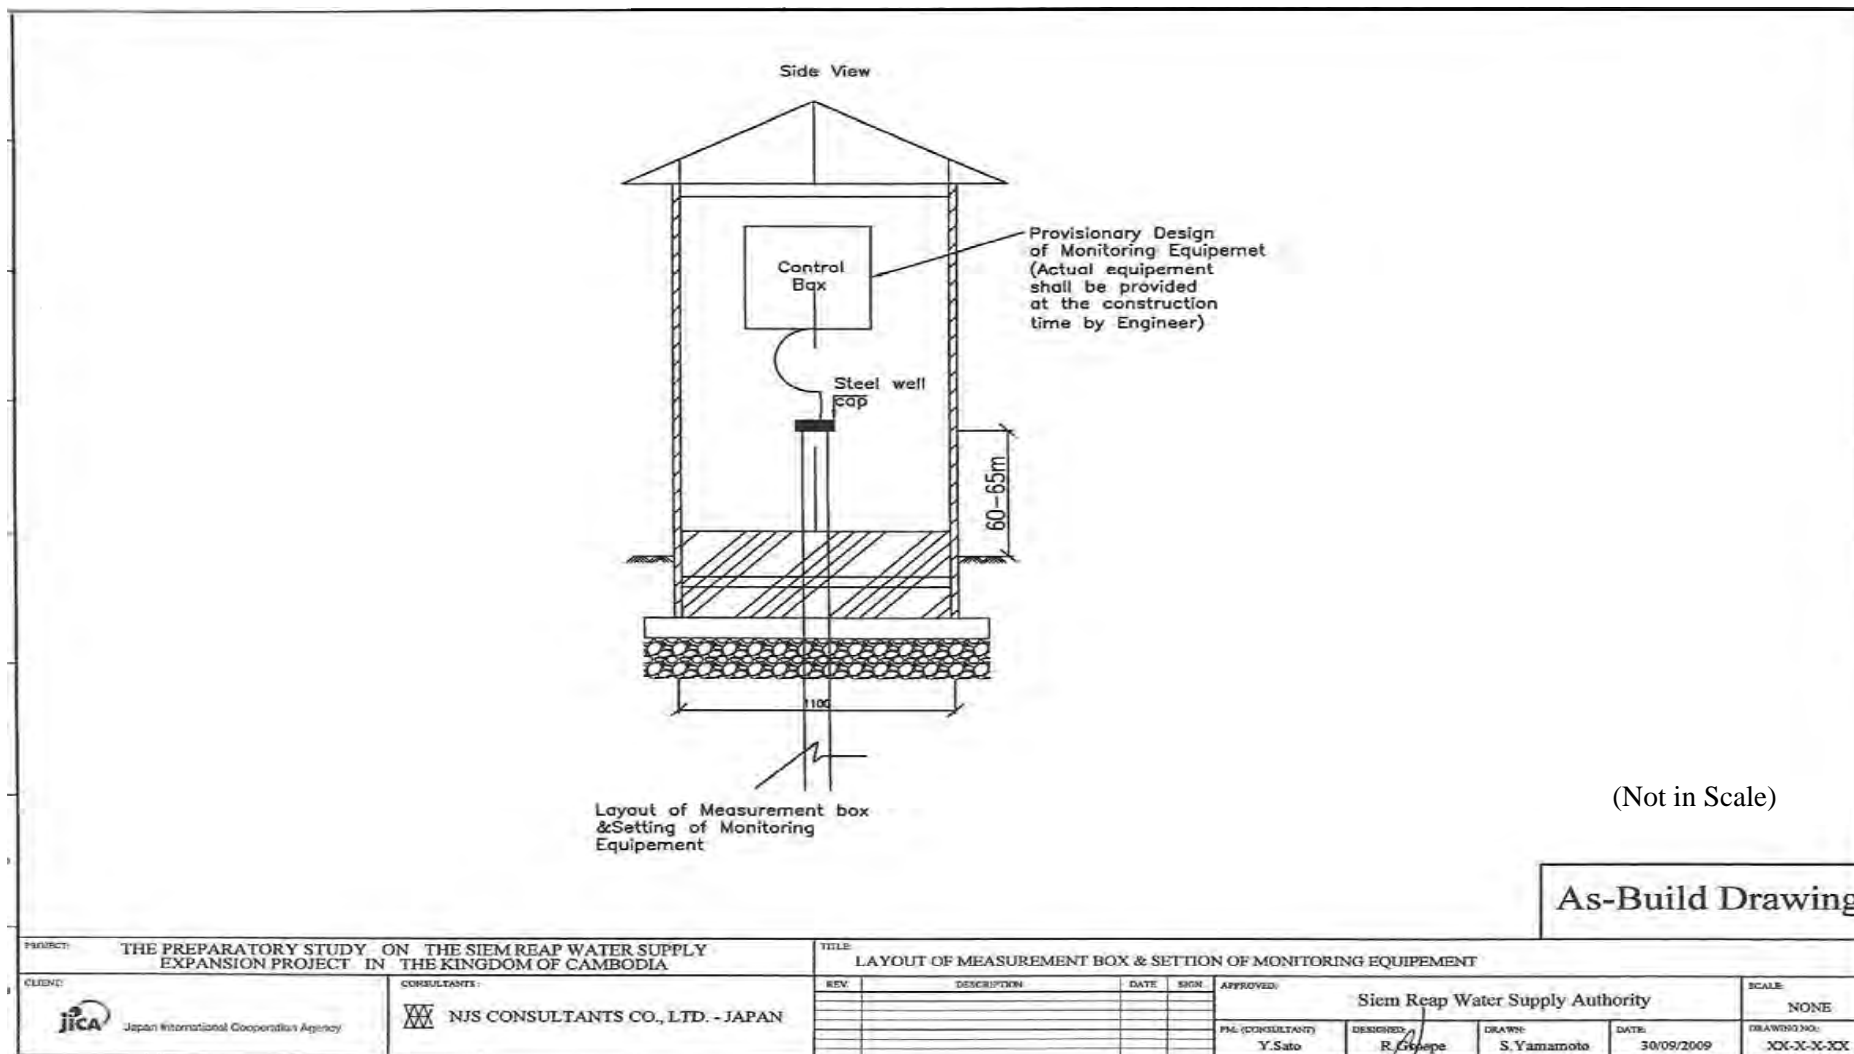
(3) As-Build Drawing of Layout of Measurement Box and Setting of Monitoring Equipment
